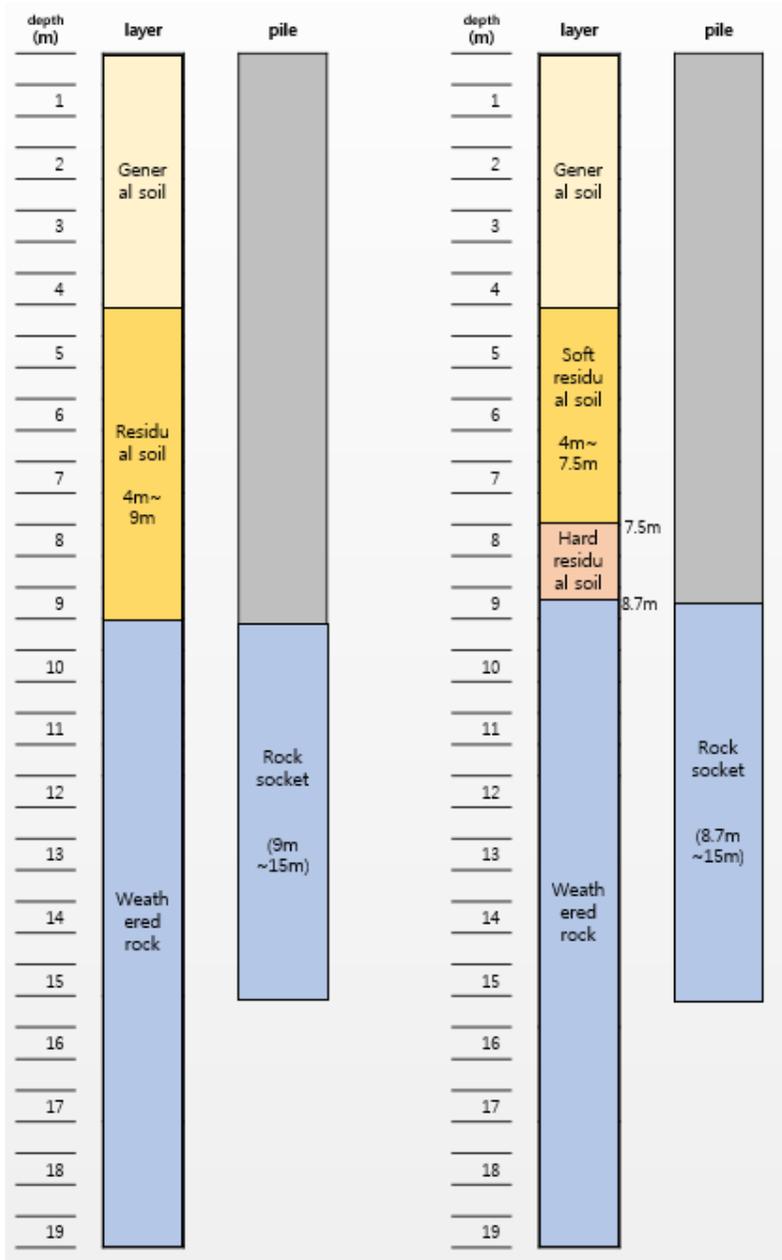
Section view of the subsurface layer for pile No. 10 before and after modification
